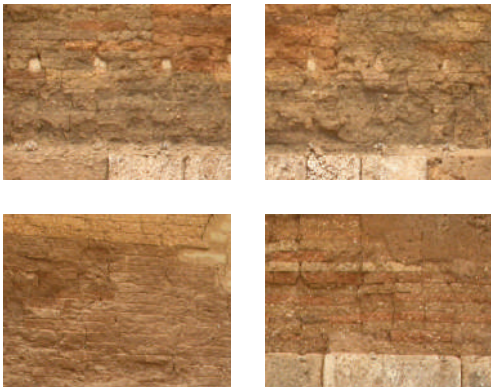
Rammed earth bricks of Capo Soprano (Gela, Italy) defensive walls of IV B.C. Century (credit: Scalisi, 2010).
